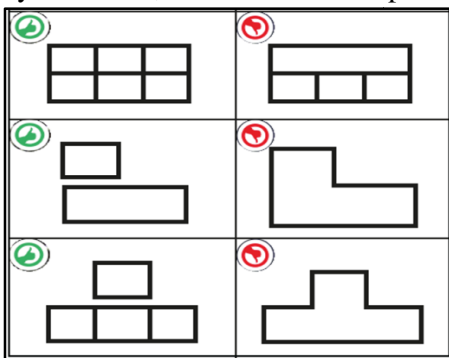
House Layout Guidelines from Residential Design and Construction Based on NSCP 2010
